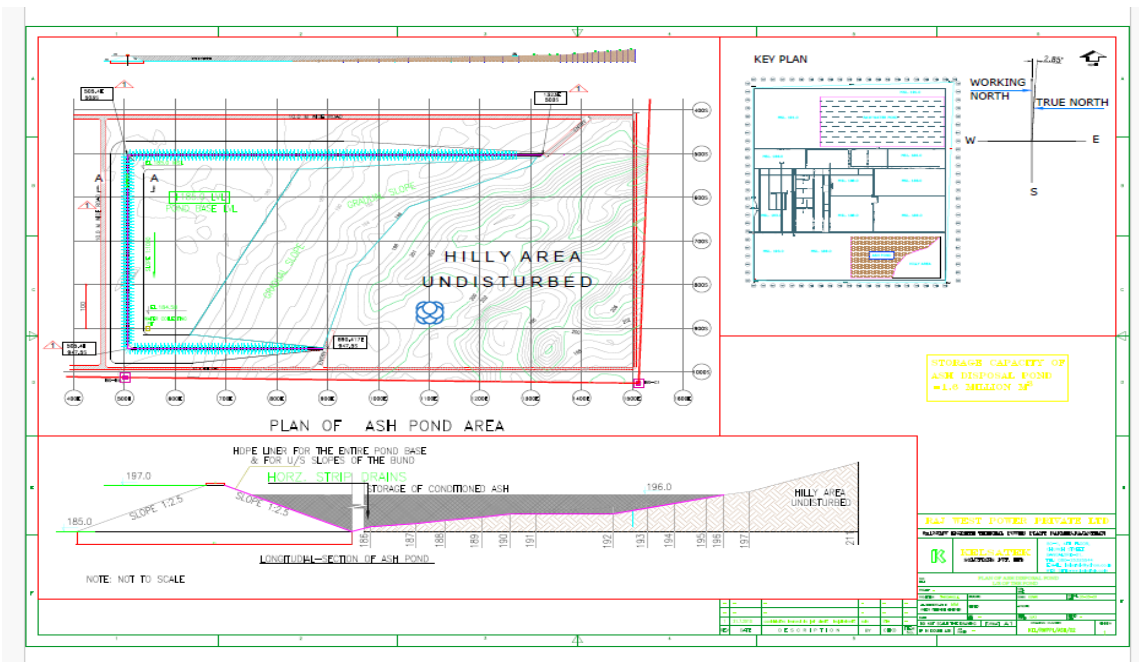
PLAN OF ASH DISPOSAL POND-L/S OF THE POND
